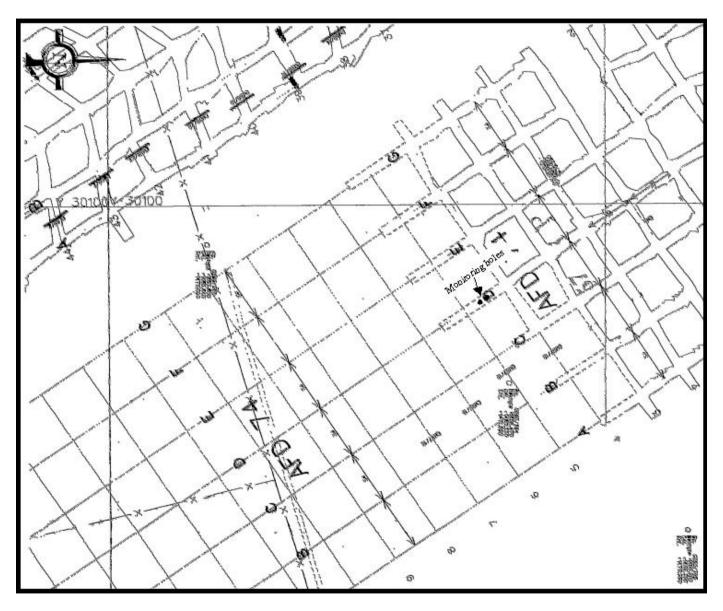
Section plan Colliery 'E' Site 1 (not scaled)
